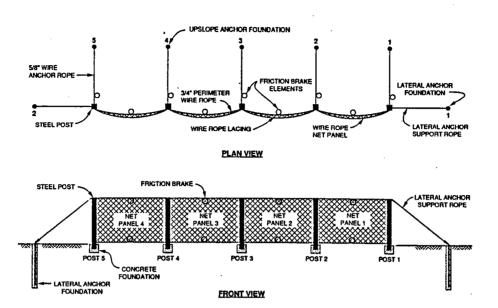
PLAN VIEW AND FRONT VIEW OF BRUGG ROCK NET
